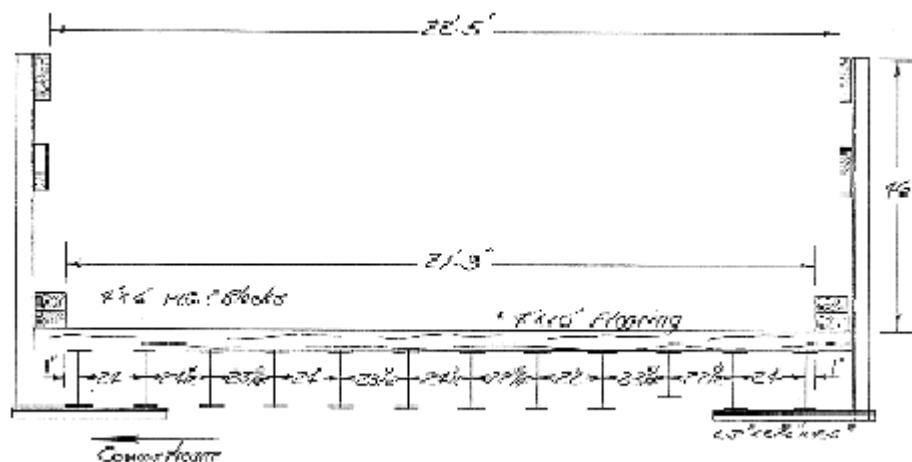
Transverse view schematic of the old bridge structure, showing steel stringer spacing.
